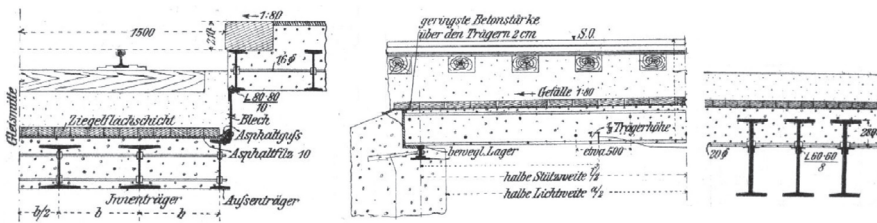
Typical detailing for railway bridge with rolled beams encased or partially encased in concrete [8]
